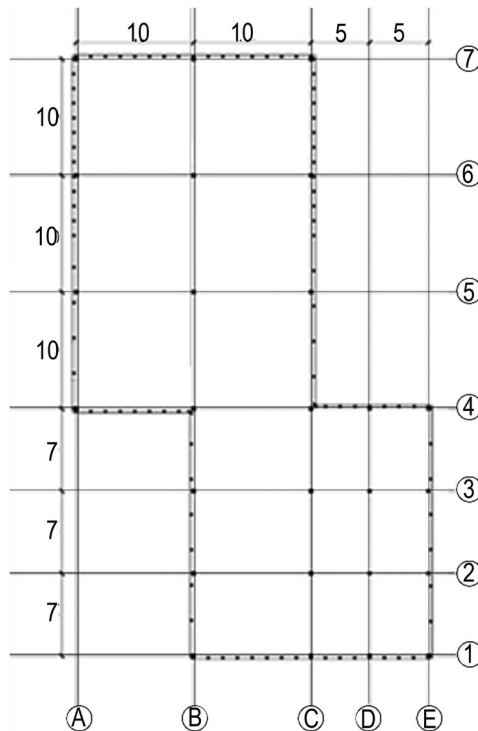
New building plan. This plan was presented after some changes in the extant building.
